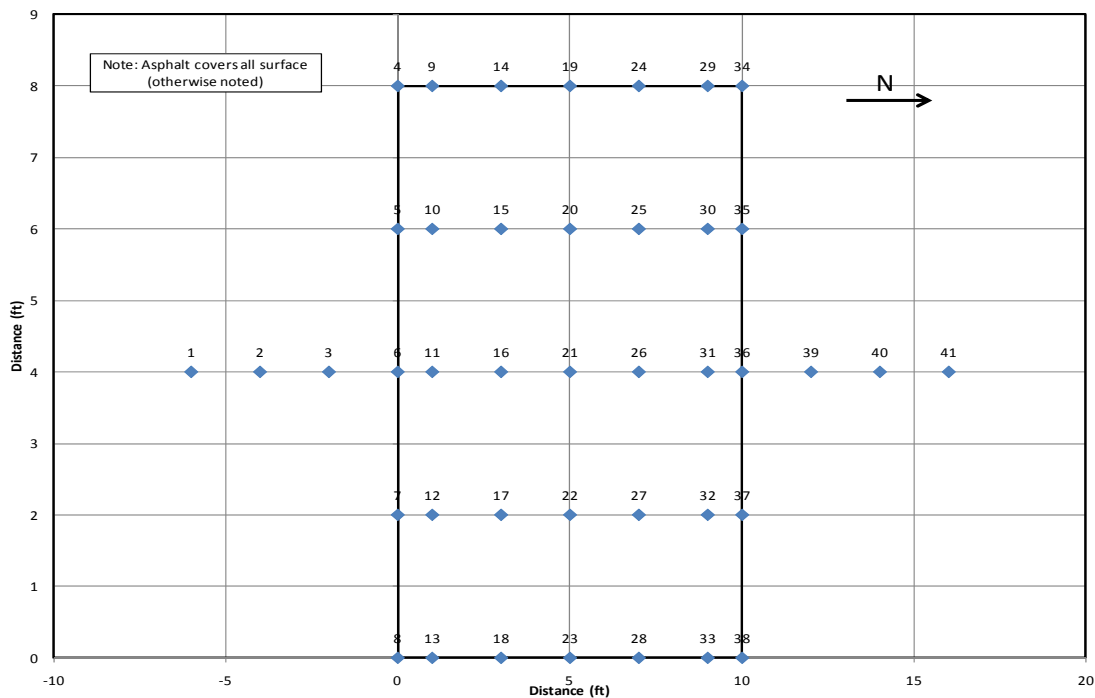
Location of points used to survey the elevation of the surface of the pavement on top of the trench and surrounding area
